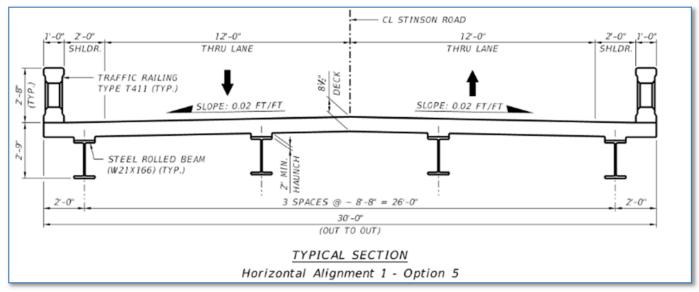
Steel Rolled Beams (W21X166) Typical Section
